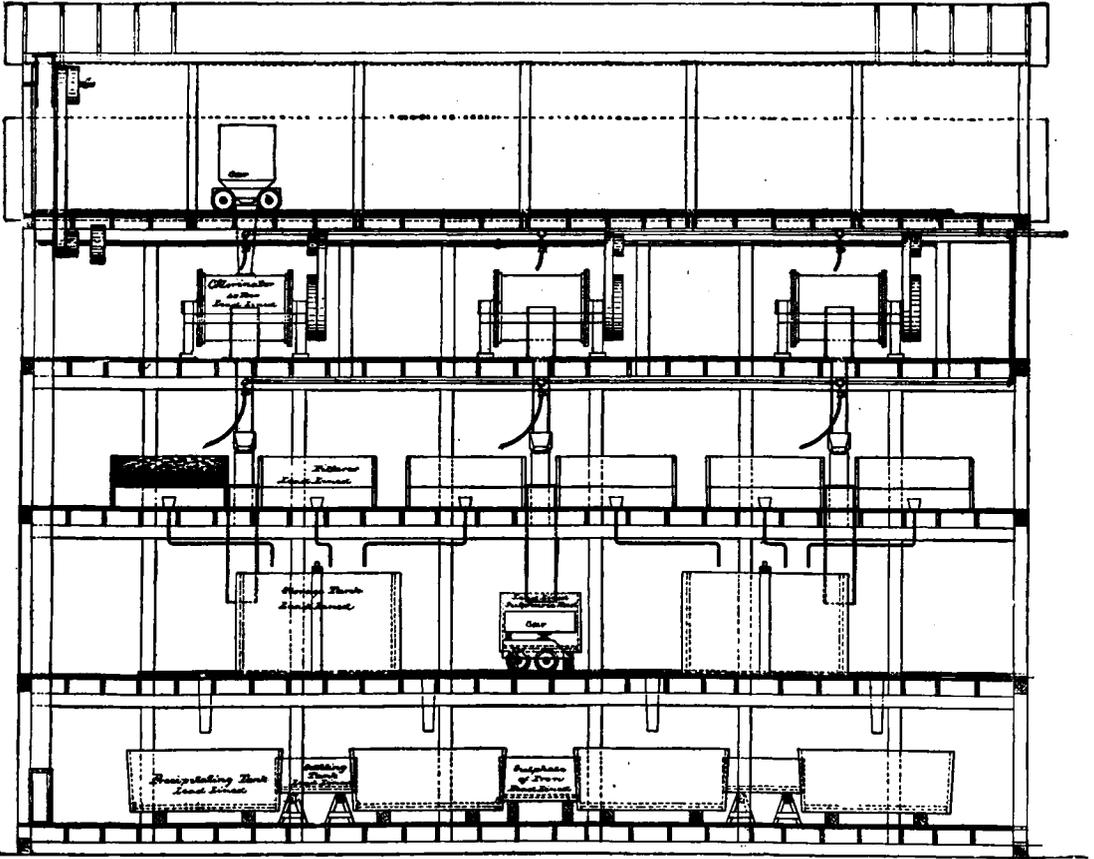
Chlorination plant at the Haile Gold Mine. Vertical Longitudinal Section.
